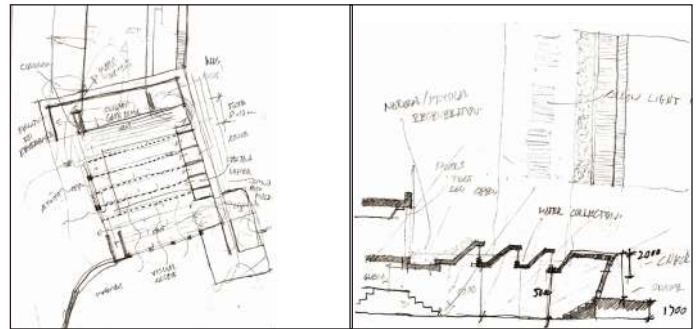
Multipurpose sports centre layout and roof design to allow natural light into the space (Author: 2019)
